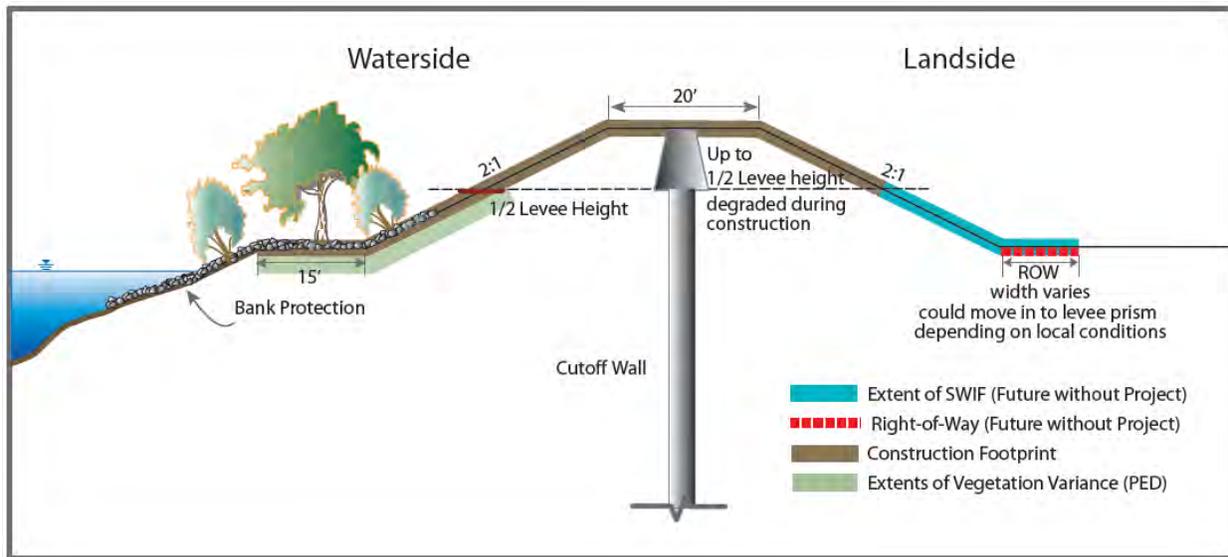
Fix-In-Place with Cutoff Wall and No Levee Raise.
